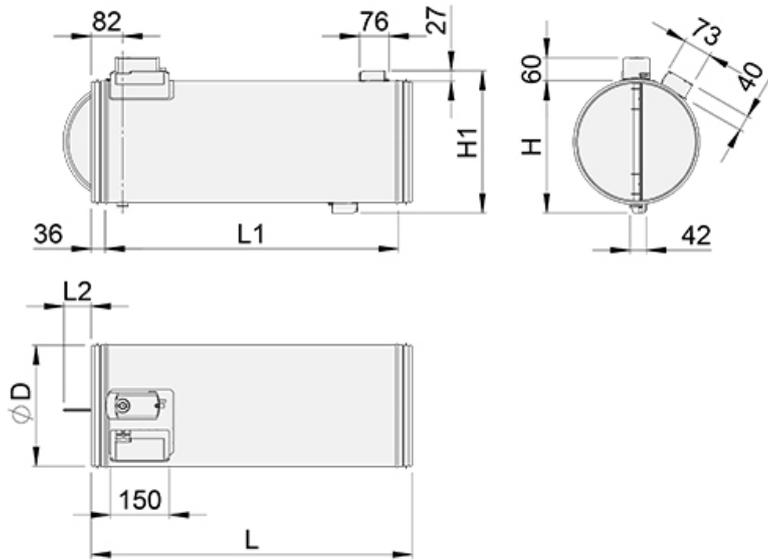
Halton Max Ultra Circular (MUC) dimensions, $D=100-315$
